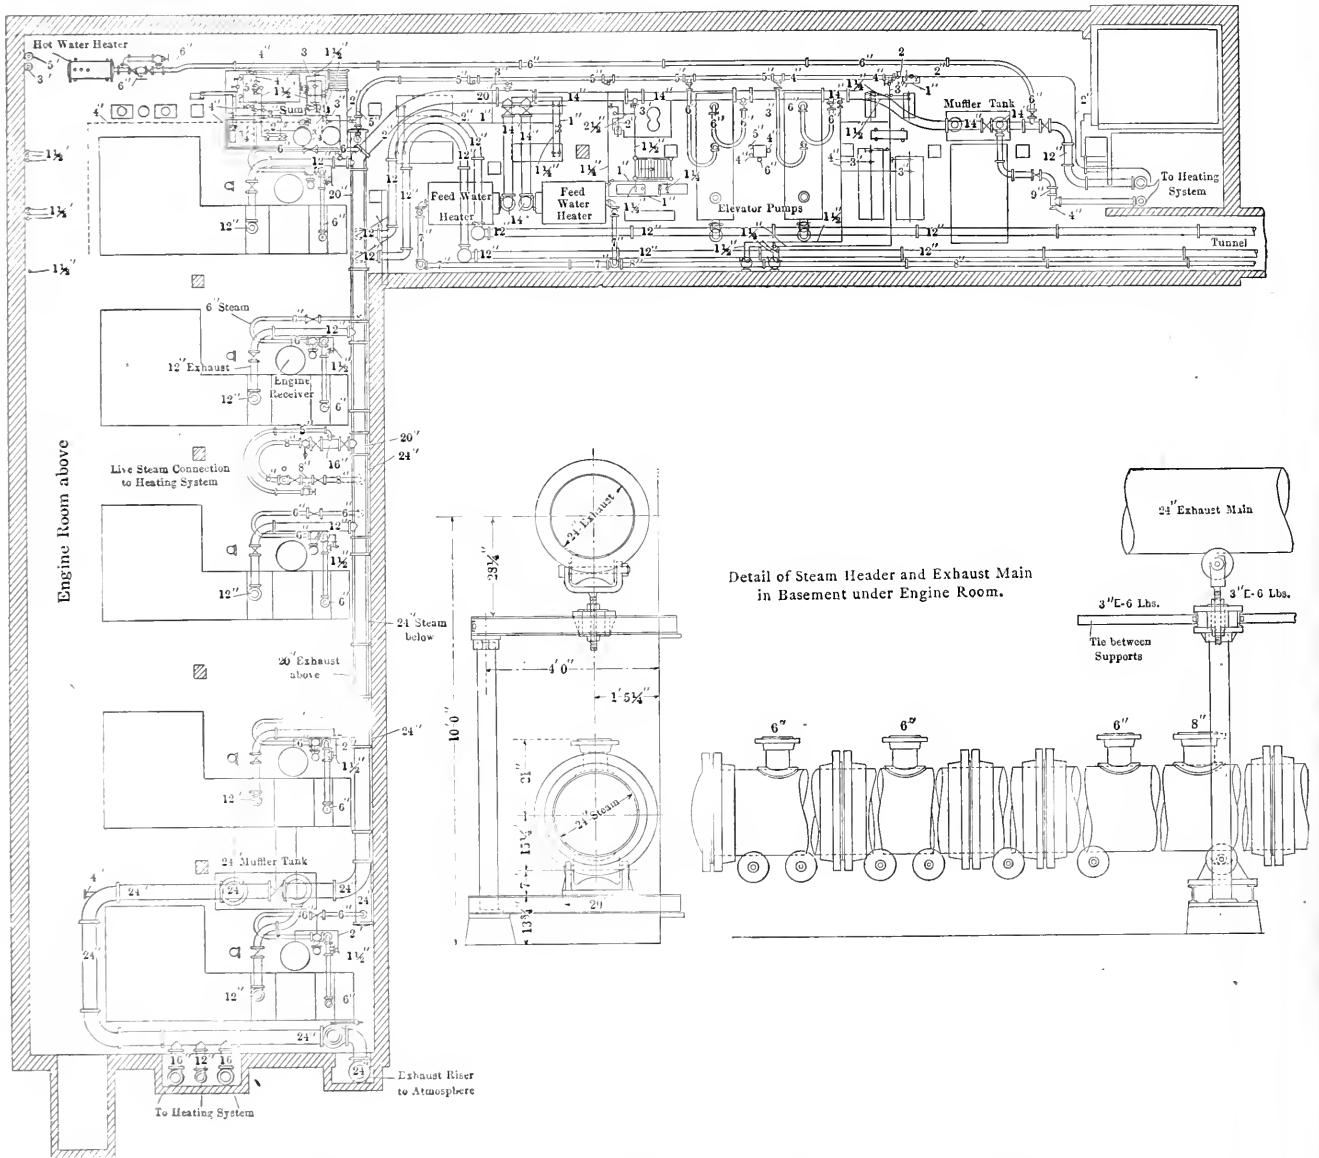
PLAN OF PIPE CELLAR AND ELL EXTENSION AND STEAM AND EXHAUST HEADER DETAIL
